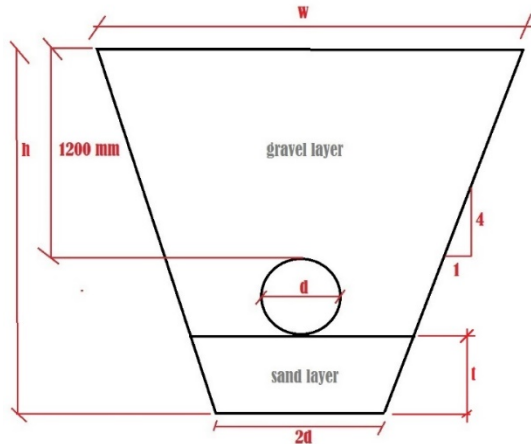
Cross-section of Building Drainage Figure 11: Plan View of Perimeter Drainage
